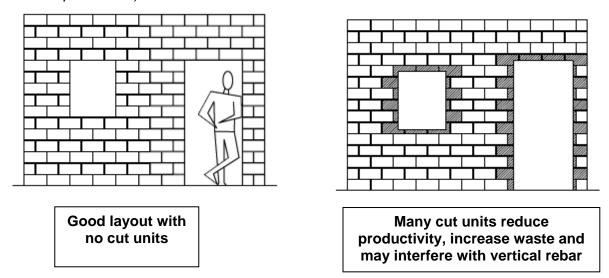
Examples of good and poor masonry layout (MIBC, 2008, reproduced by permission of the Masonry Institute of BC).
